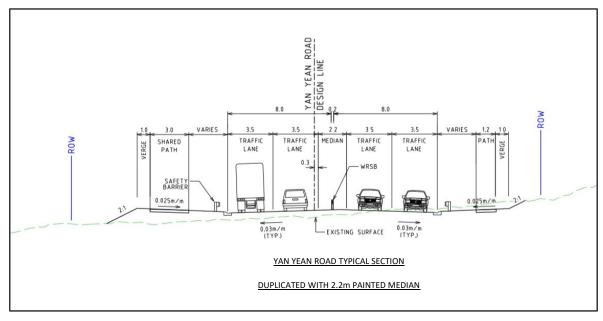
Yan Yean Road Upgrade, typical cross section
